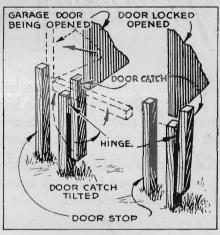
Hinged sticks set at side of garage door, as shown above, will make a simple door stop.
